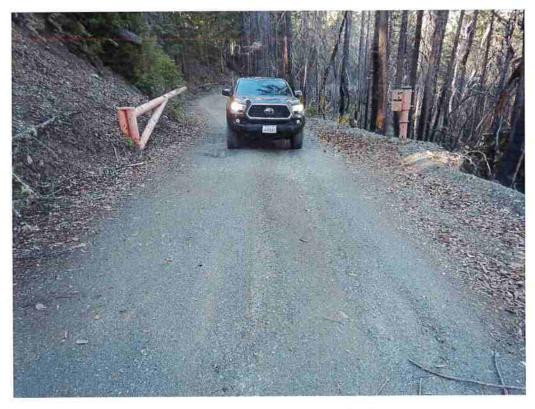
RP 18. Vehicle traveling south-east, photo taken facing north-west.
